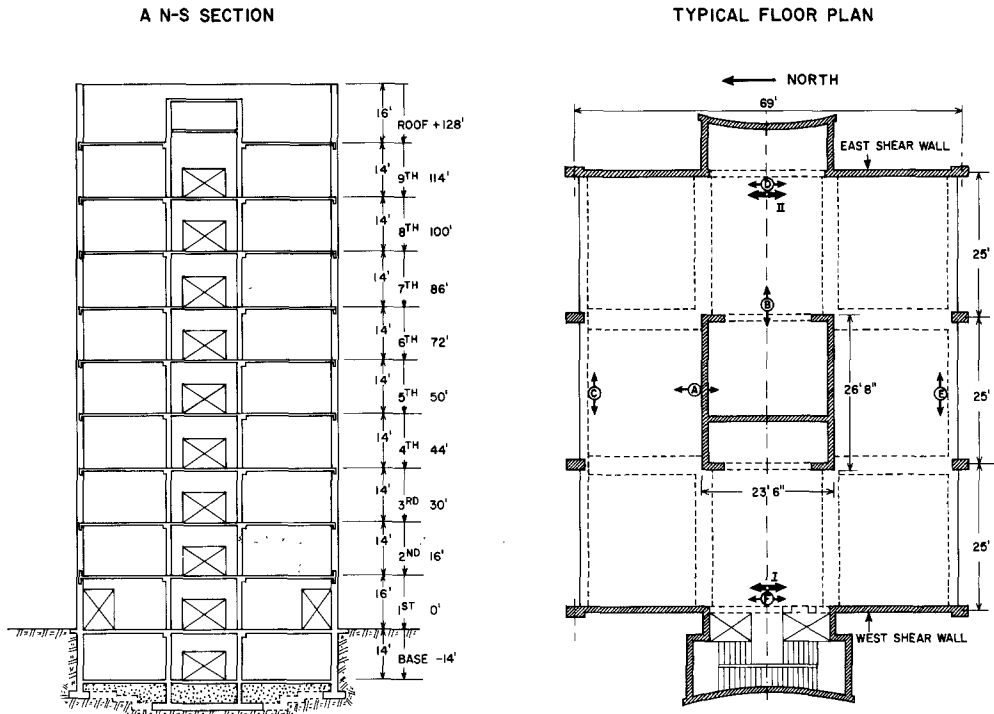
Millikan Library Building. *Left*, a NS section; *right*, typical floor plan.
